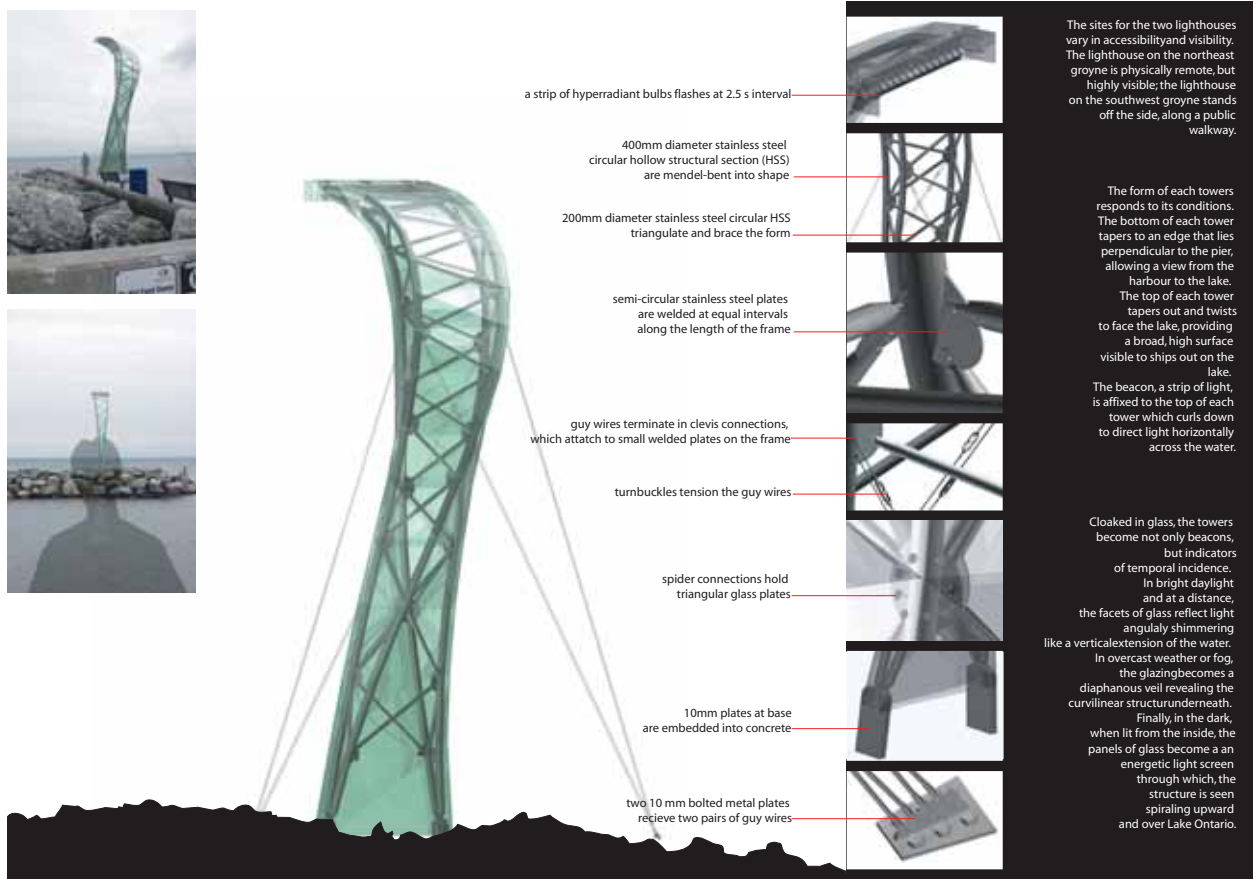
Final Tower Project, Neill, Bragg and Manchester.
